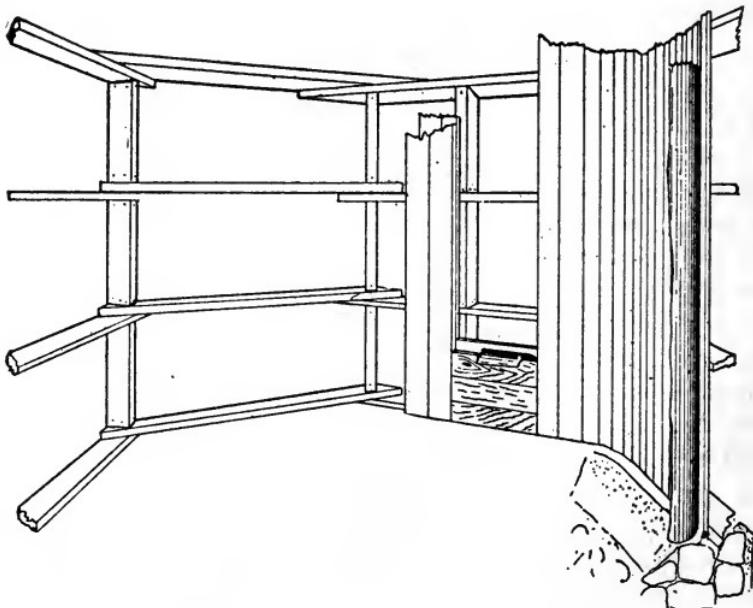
Perspective, showing construction of frame, and double lining with paper between. The door is made of two thicknesses with paper between, as shown.
